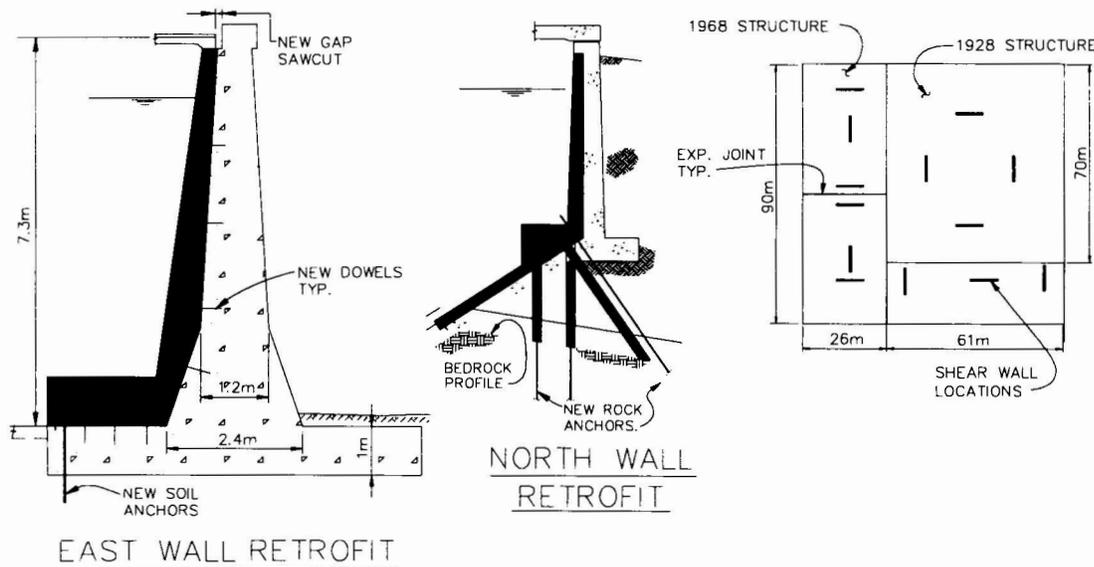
Vancouver Heights reservoir plan indicating new shear walls locations and retrofit of the existing walls.
